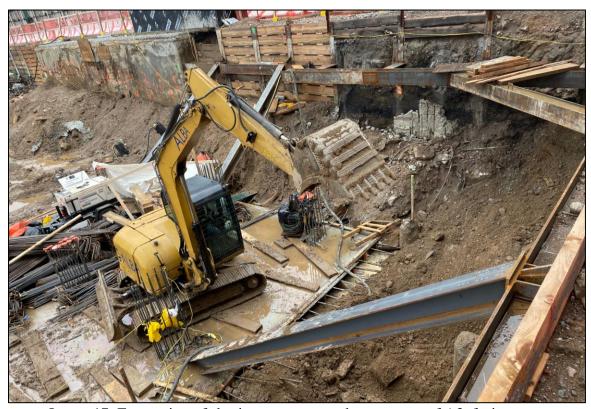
Excavation of shoring support, southeast corner of A3, facing east.
